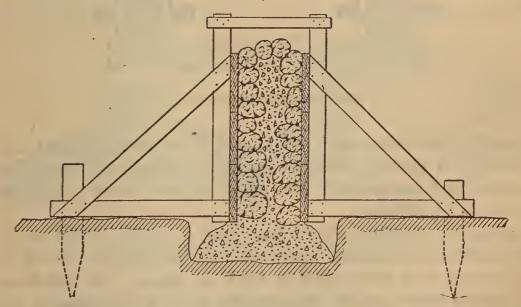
Form for Building Boulder or "Niggerhead" Wall.
